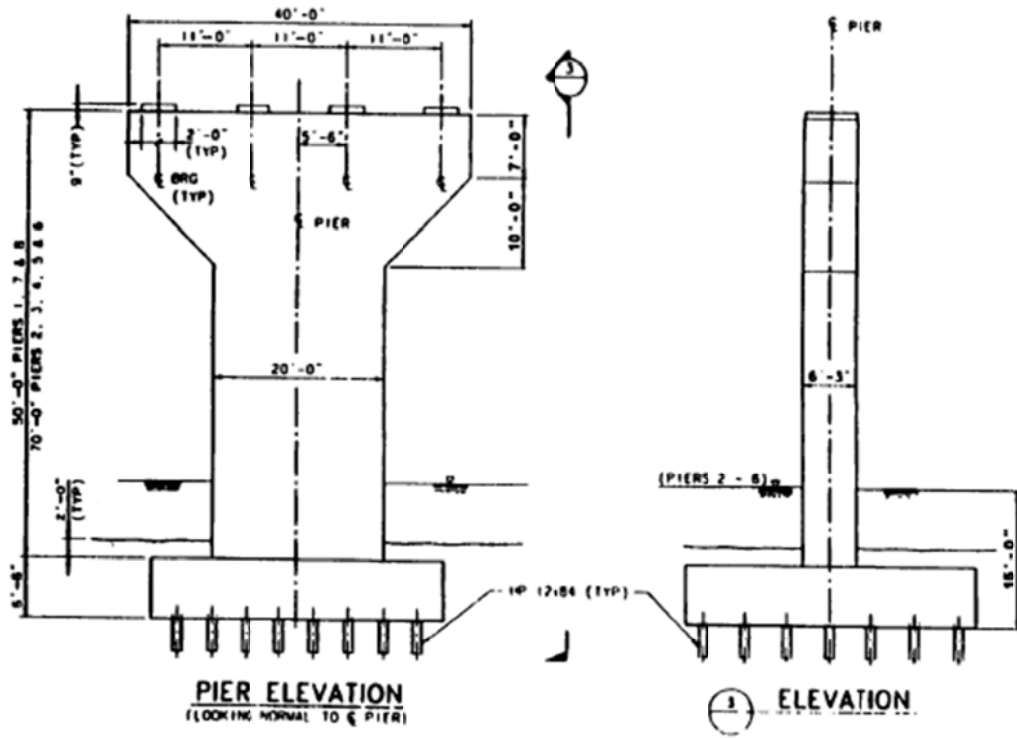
Bridge No. 1 – Intermediate Pier Elevations
